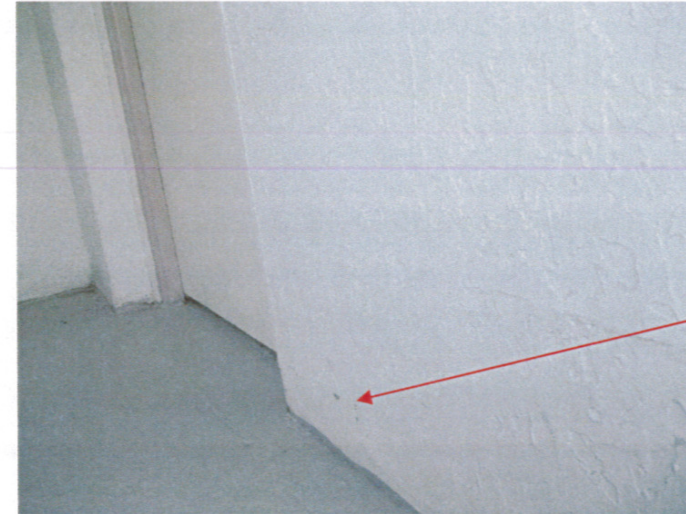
Garage - 4\" T-Joint, White Wrapped Thermal System Insulation (TSI).
